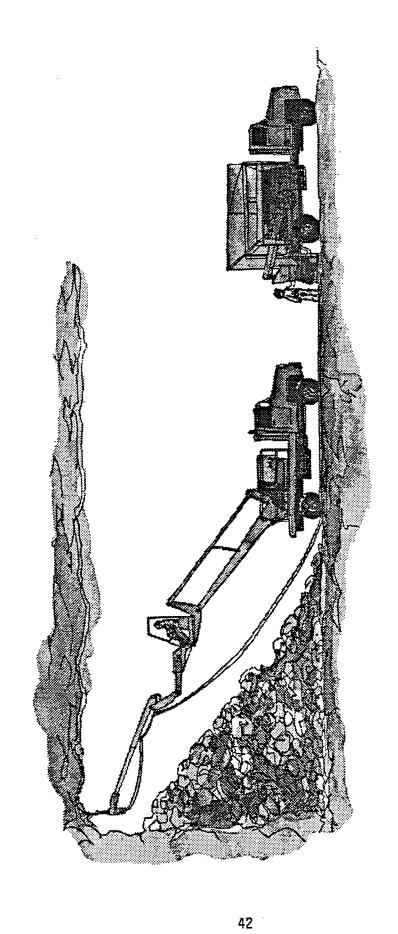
Candidate Shotcrete Equipment for ERSF (Trixer and the Mini-Robot, Manufactured by Stabilator).
